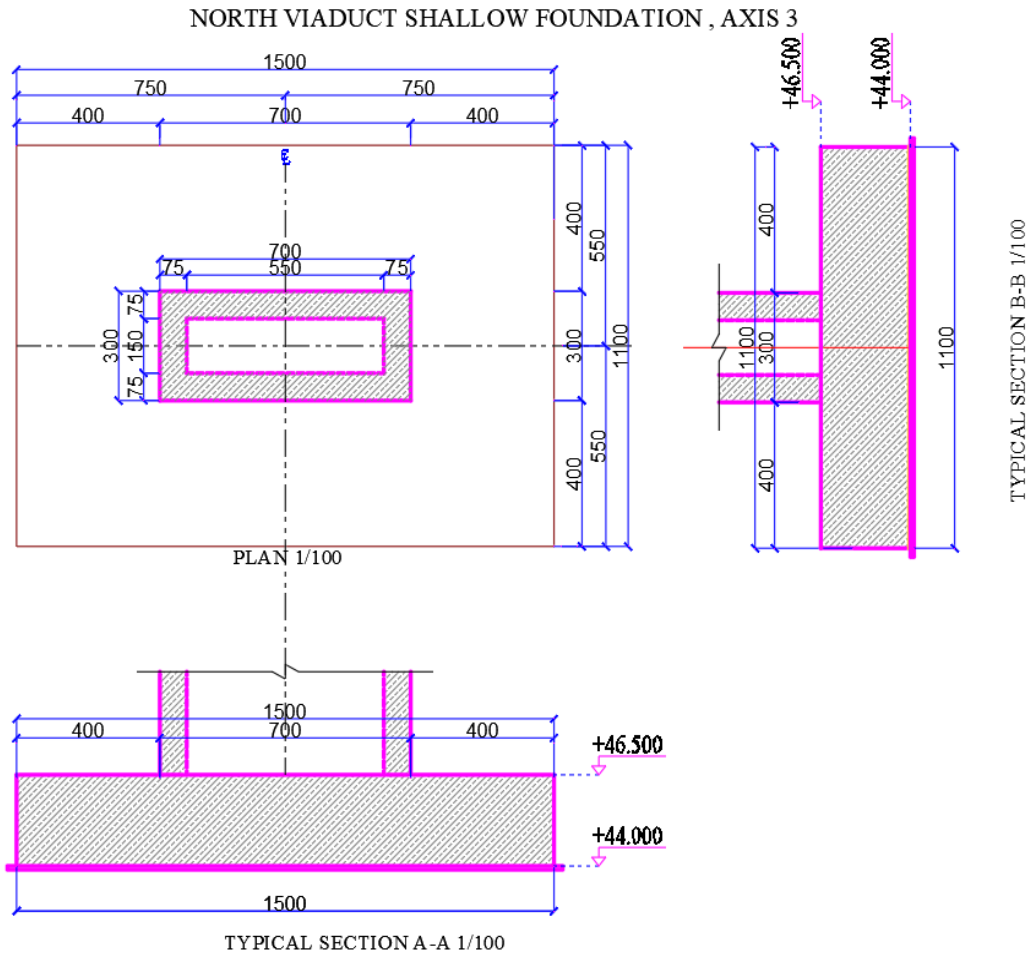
Foundation Plan and Typical Sections (North Viaduct Axis 3)
